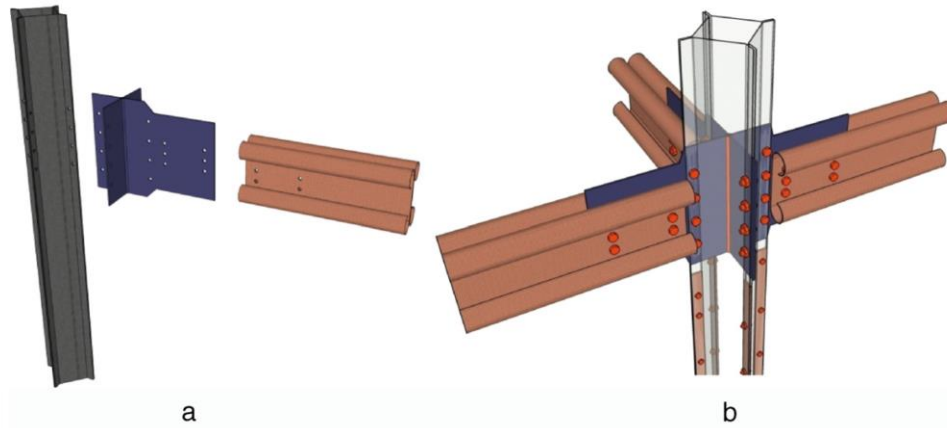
CFS beam–column connections: (a) Diamond column, cross through plates and curved flange beam. (b) Assembled moment resistant connections [13].
